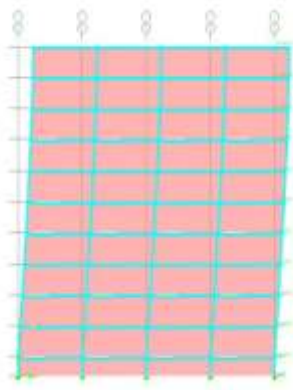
Model 3: G+10 RC building of full infill wall with slab element lateral displacement
